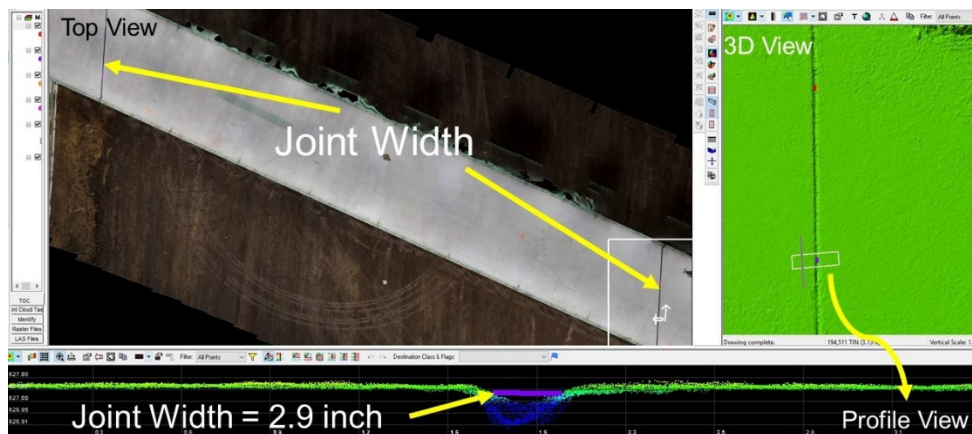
Joint Width Sections at Two Joints on the Bridge Deck
